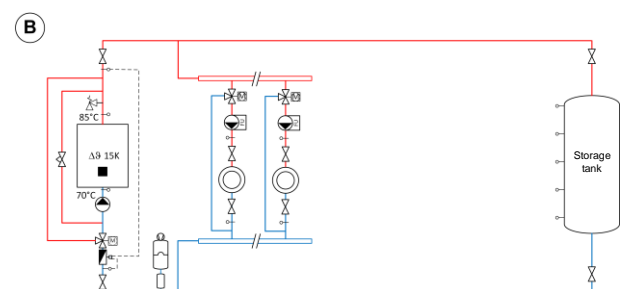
Hydraulic integration of heat storage tank - circuit B.
